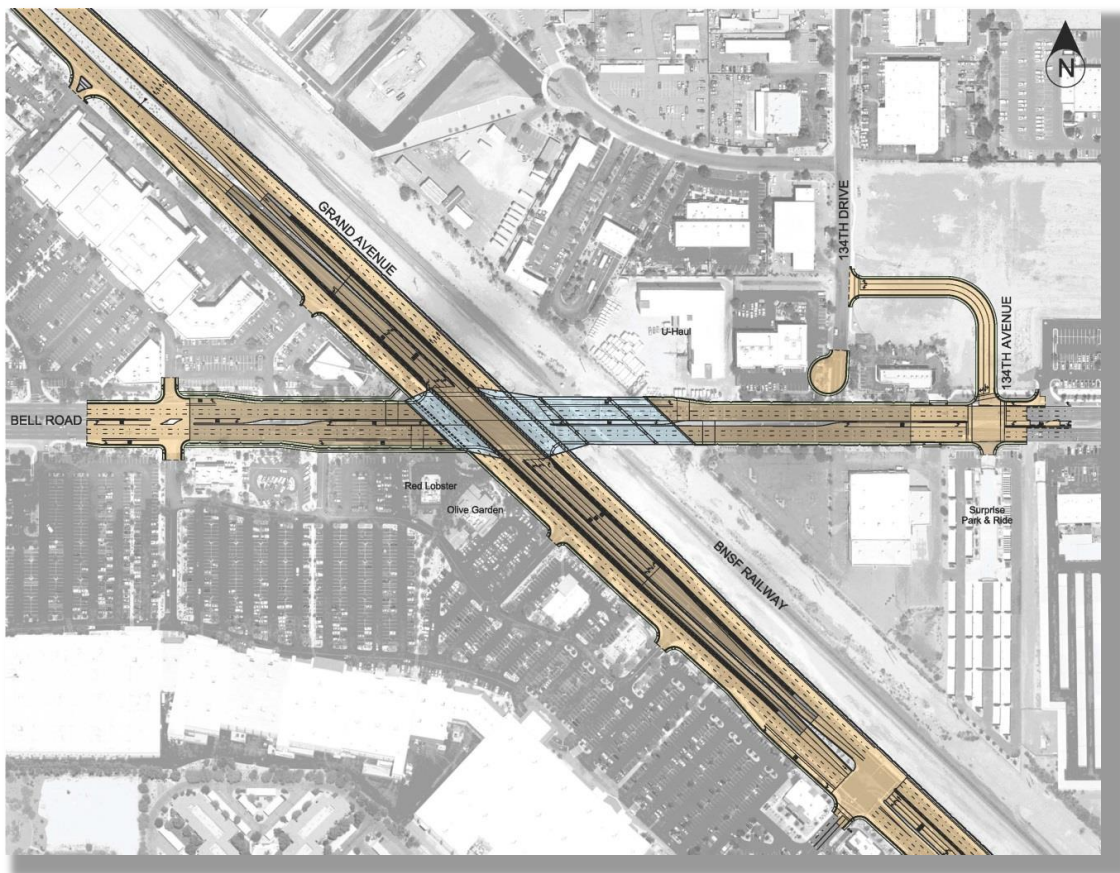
Aerial view of Bell Road and US60, Surprise, Arizona.
